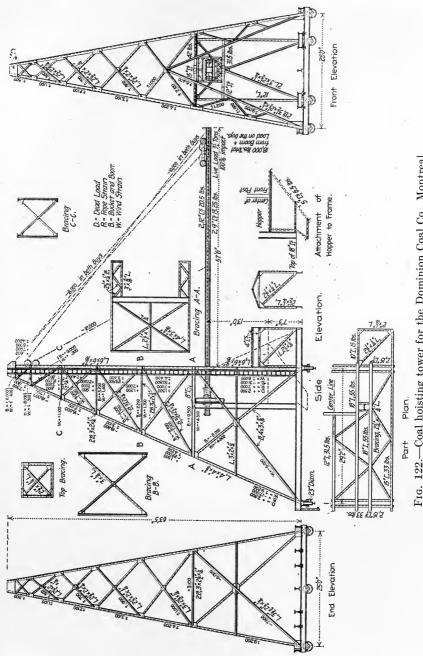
Coal hoisting tower for the Dominion Coal Co., Montreal.
